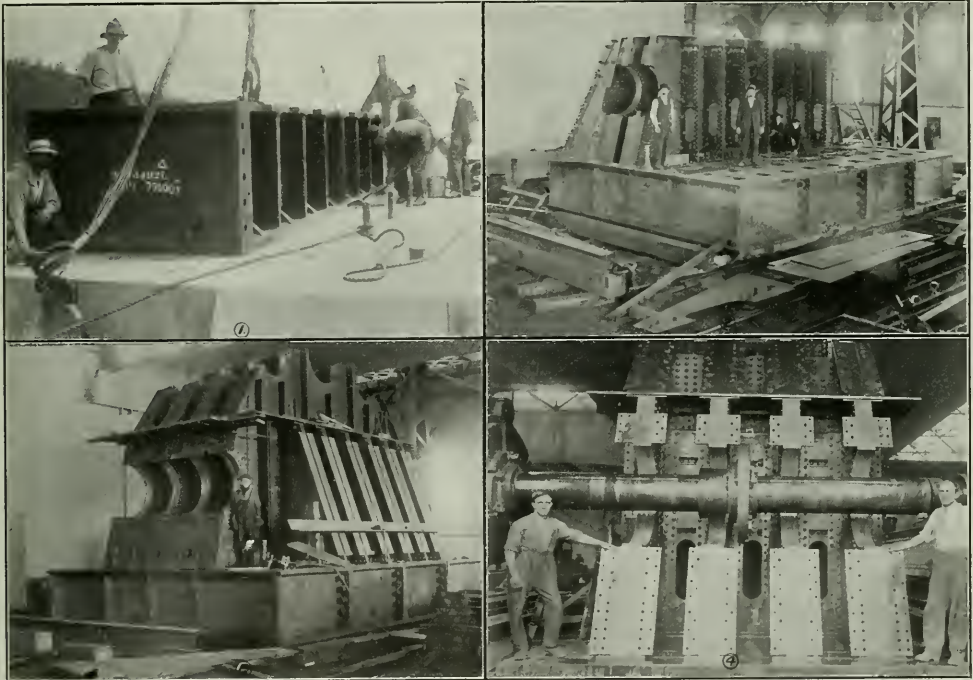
One of the 4 Castings Being Placed on the Pier. Fig. 2.—Casting Assembled (shop) and Second Story Under Construction. Fig. 3.—Second and Third Stories Nearing Completion. Fig. 4.—Method of Boring 45-inch Pin-hole.
